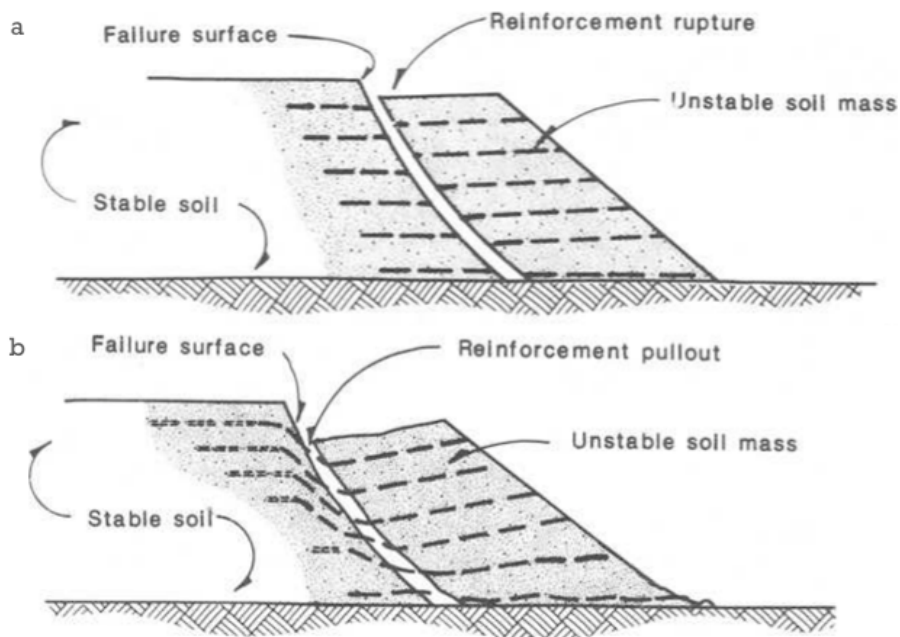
Internal failure of reinforcement in slopes: (a) reinforcement rupture; and (b) reinforcement pull-out (Bonaparte et al., 1987)
